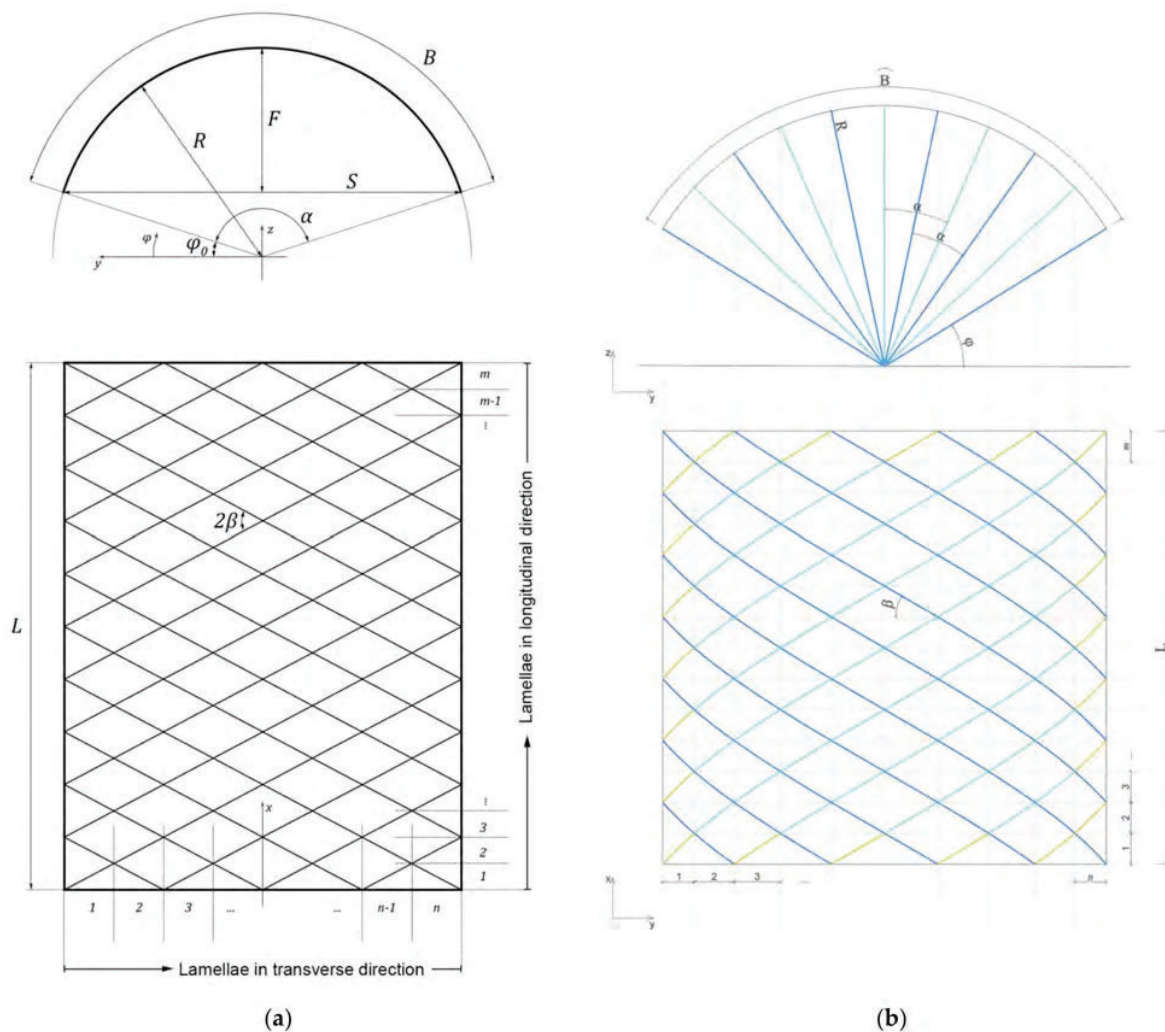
Floor plan and section of the lamella vault for geometrical analysis (a) by Tutsch [13]; (b) by the authors.
